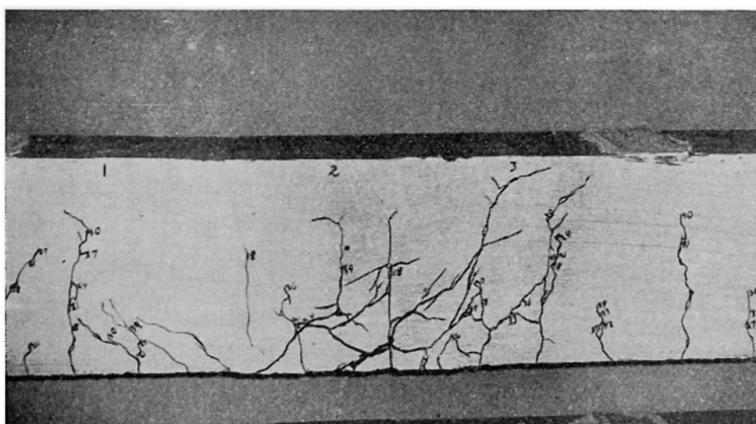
From a test of beams shown in Fig. 1. Typical cracks at the ends of the I-beams.
